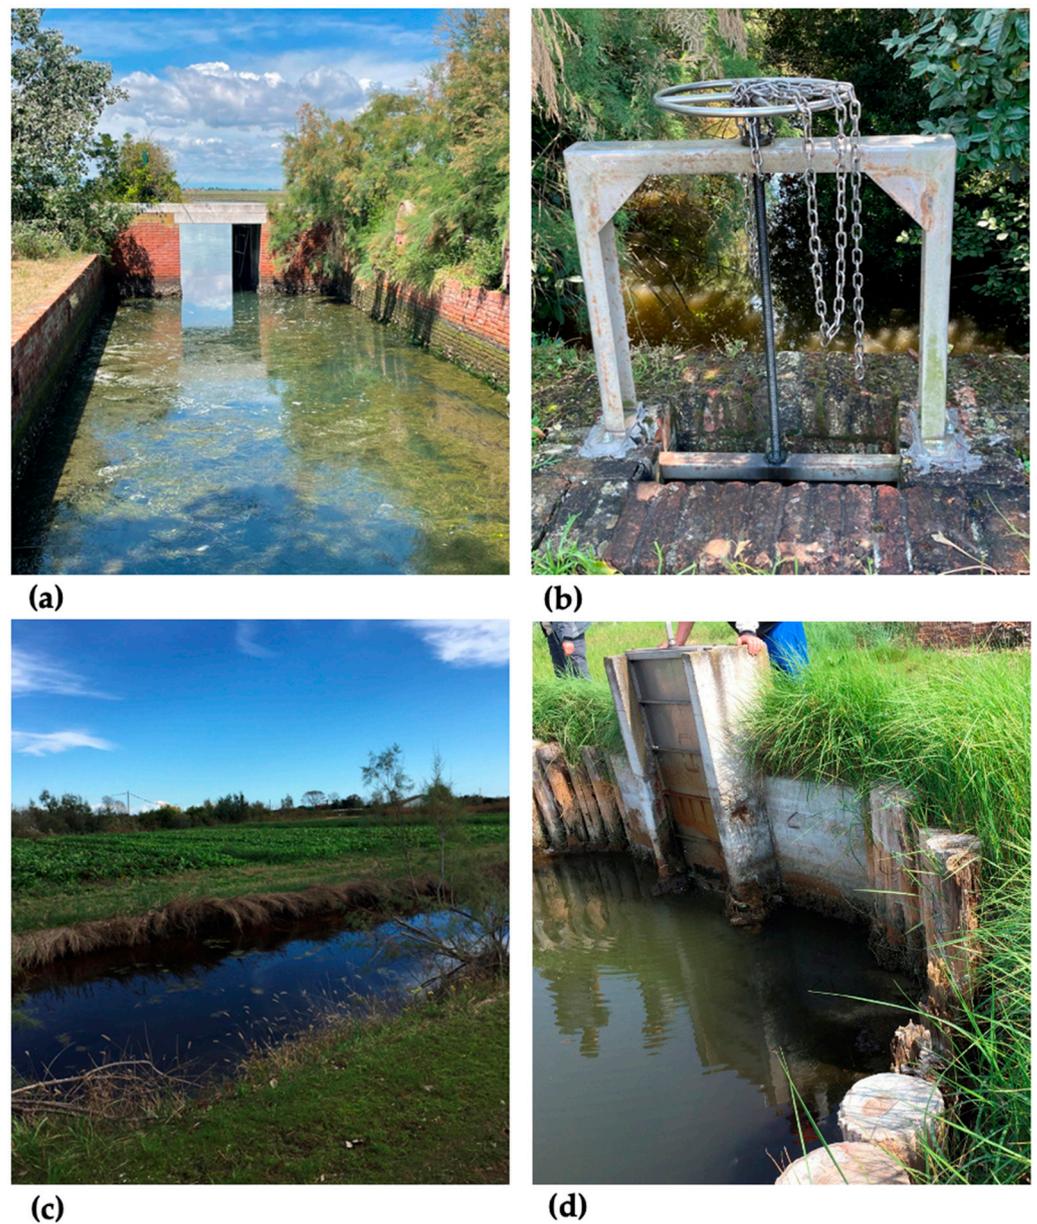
Canals and ditches in Sant’Erasmus: (a) the walled part of the island, the reclaimed area: an open canal outlet, which connects canal water to lagoon water; (b) the walled part of the island, the reclaimed area: a closed ditch lock, which separates ditch water to canal water; (c) a ditch along the perimeter of a plot of land, slightly sloping towards the ditch, thus used as a drainage system in the fields of the islands; (d) a ditch in a farmer’s field; the lock is closed so as to not allow the salty water of the adjacent canal to enter the ditch dug around the field. Credit: T.F.’s personal archive, 2023–2024.
